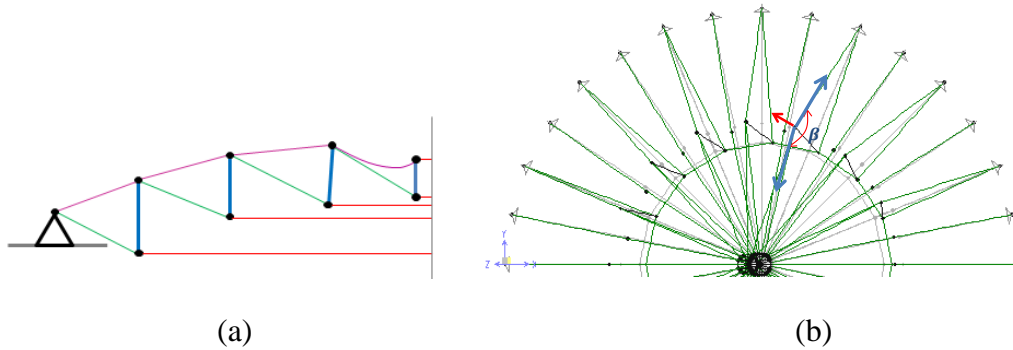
(a) Slackening of ridge cables causing in-plane instability; (b) Restraining force for out-of plane displacements
